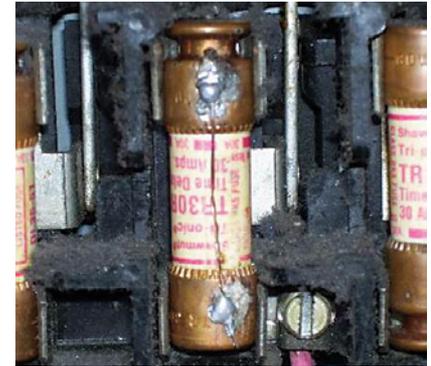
Soldered Wired Jumpering Fuse Lack of Component Integrity (NEC 110-12c) Minimum Possible Fine: \$2,000
